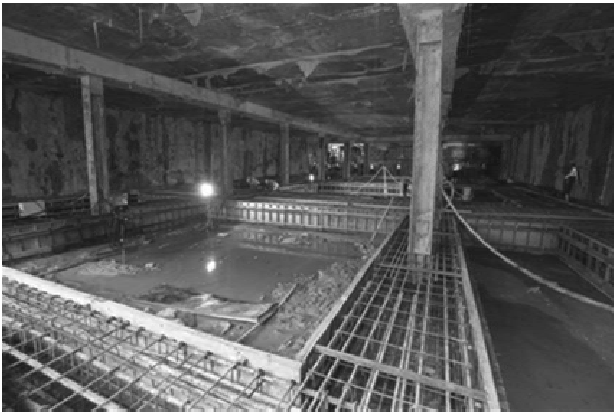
Preparation to casting the reinforced concrete struts in a 'top down' section of the project.
